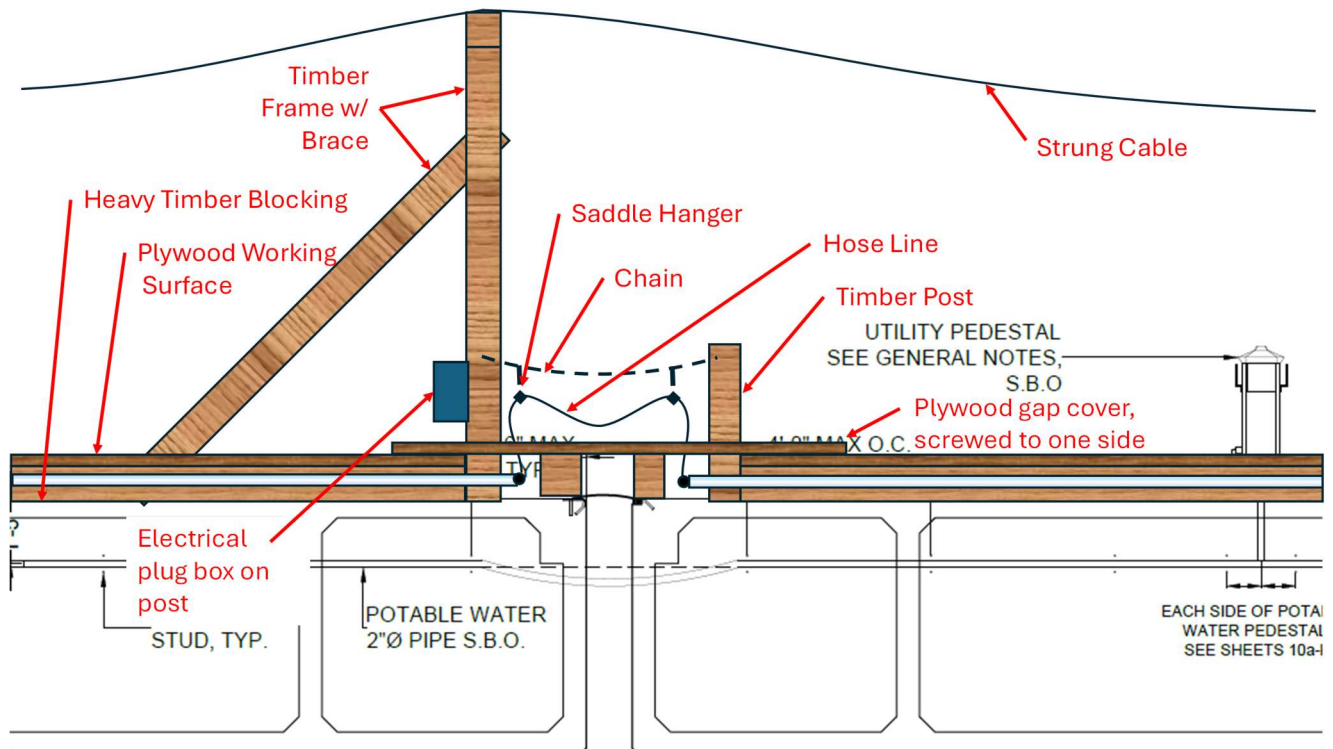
Temporary Repair Concept with Strung Cable Longitudinal Section through Float
